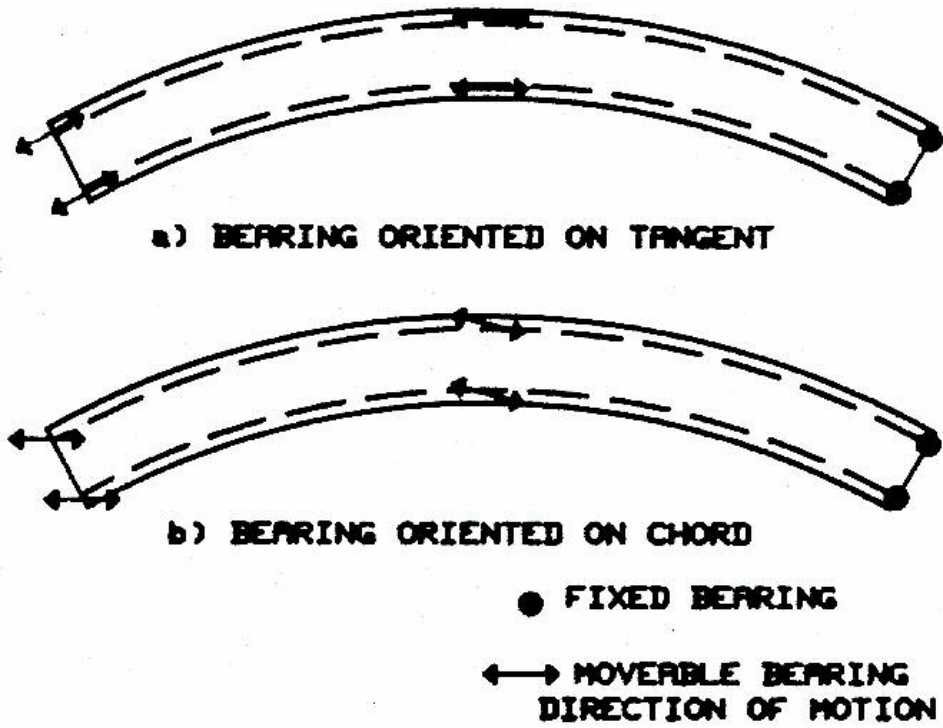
Typical Orientation and Placement of Bridge Bearings on a Curved Bridge [Source: 2.6]
